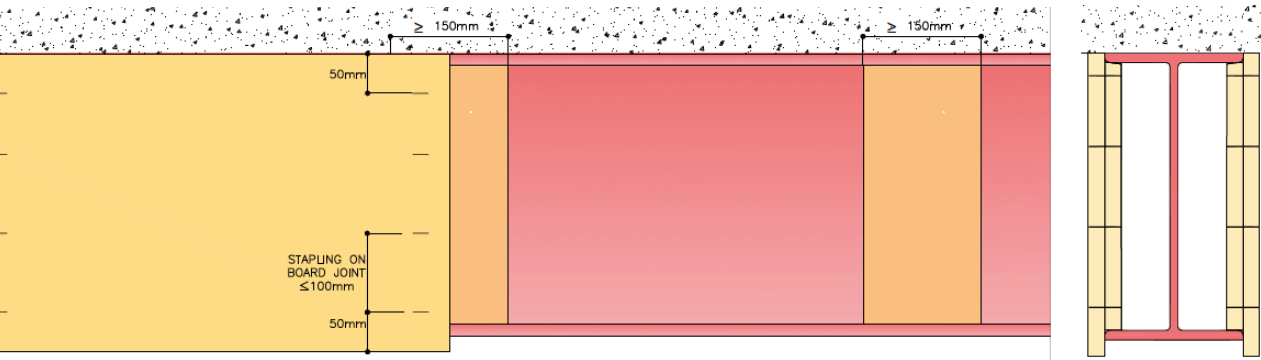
Elevation and cross-section view of Universal Steel Beam, showing fixing of Knauf Fireboard
